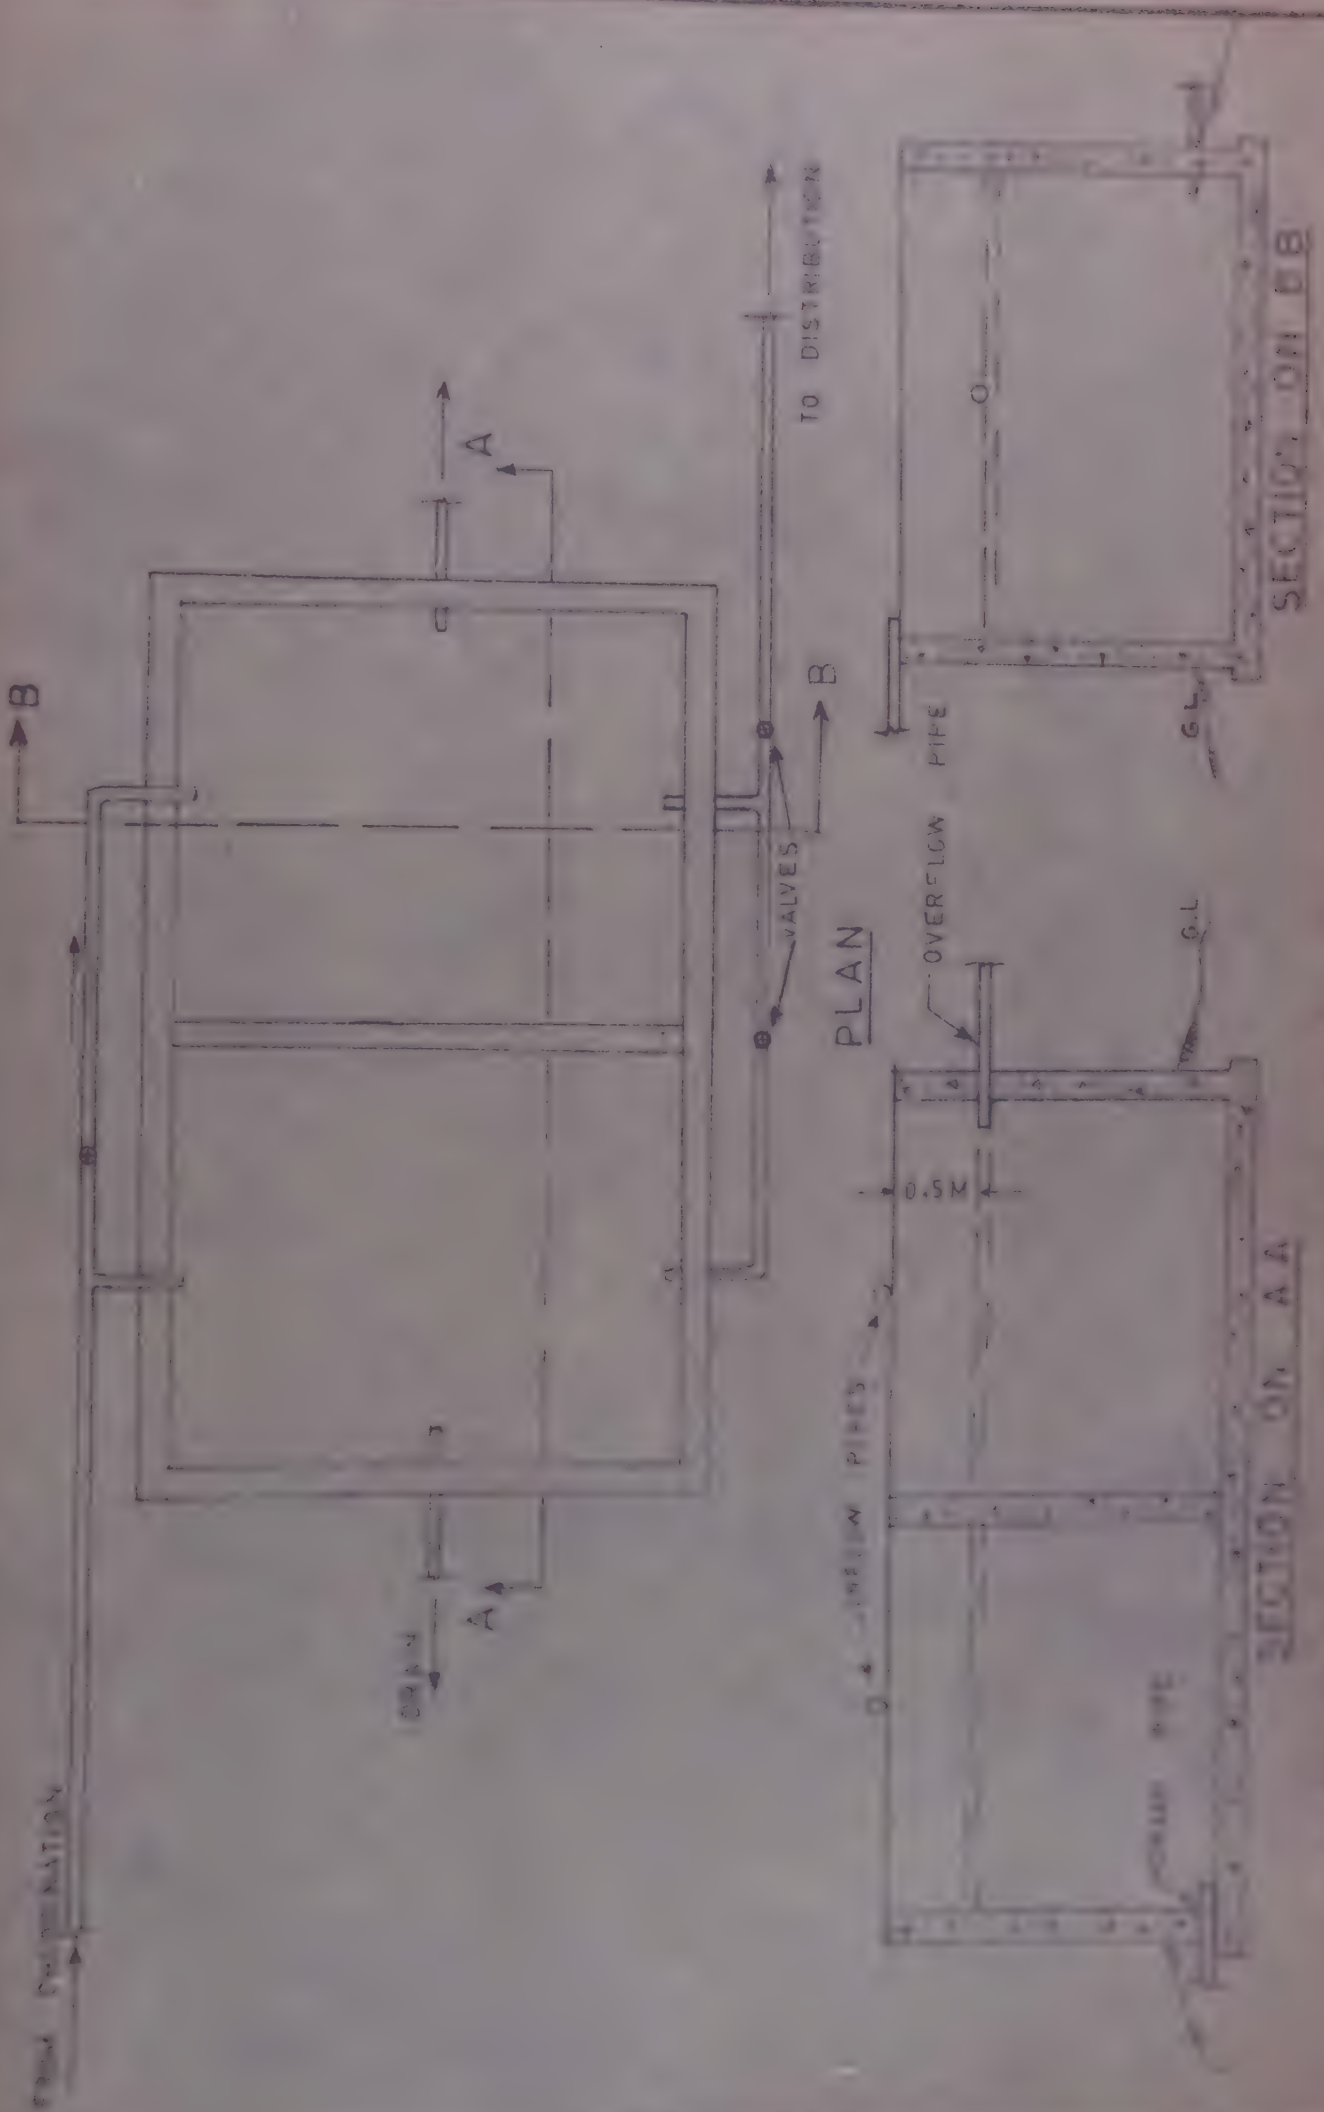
DETAILS OF A STORAGE/DISTRIBUTION CHAMBER
